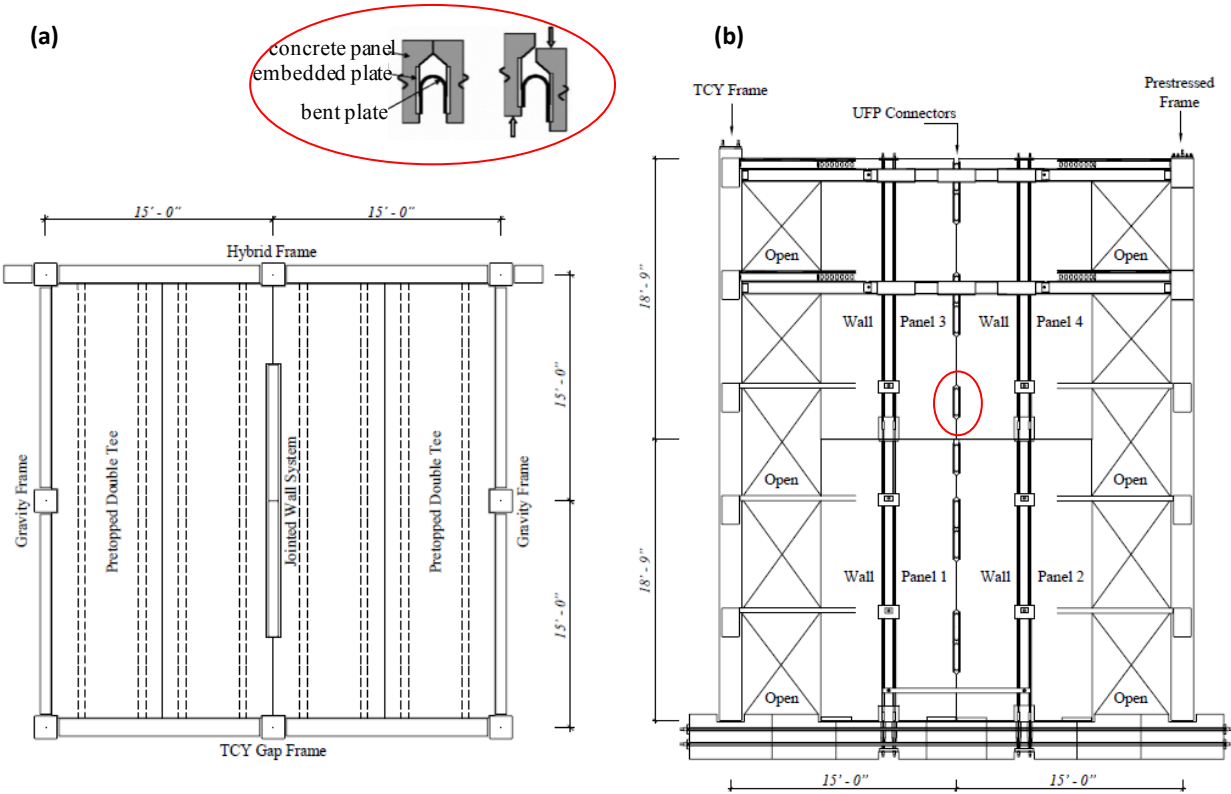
PRESSS test building; (a) plan view and (b) wall elevation (from Priestley et al. 1999)
